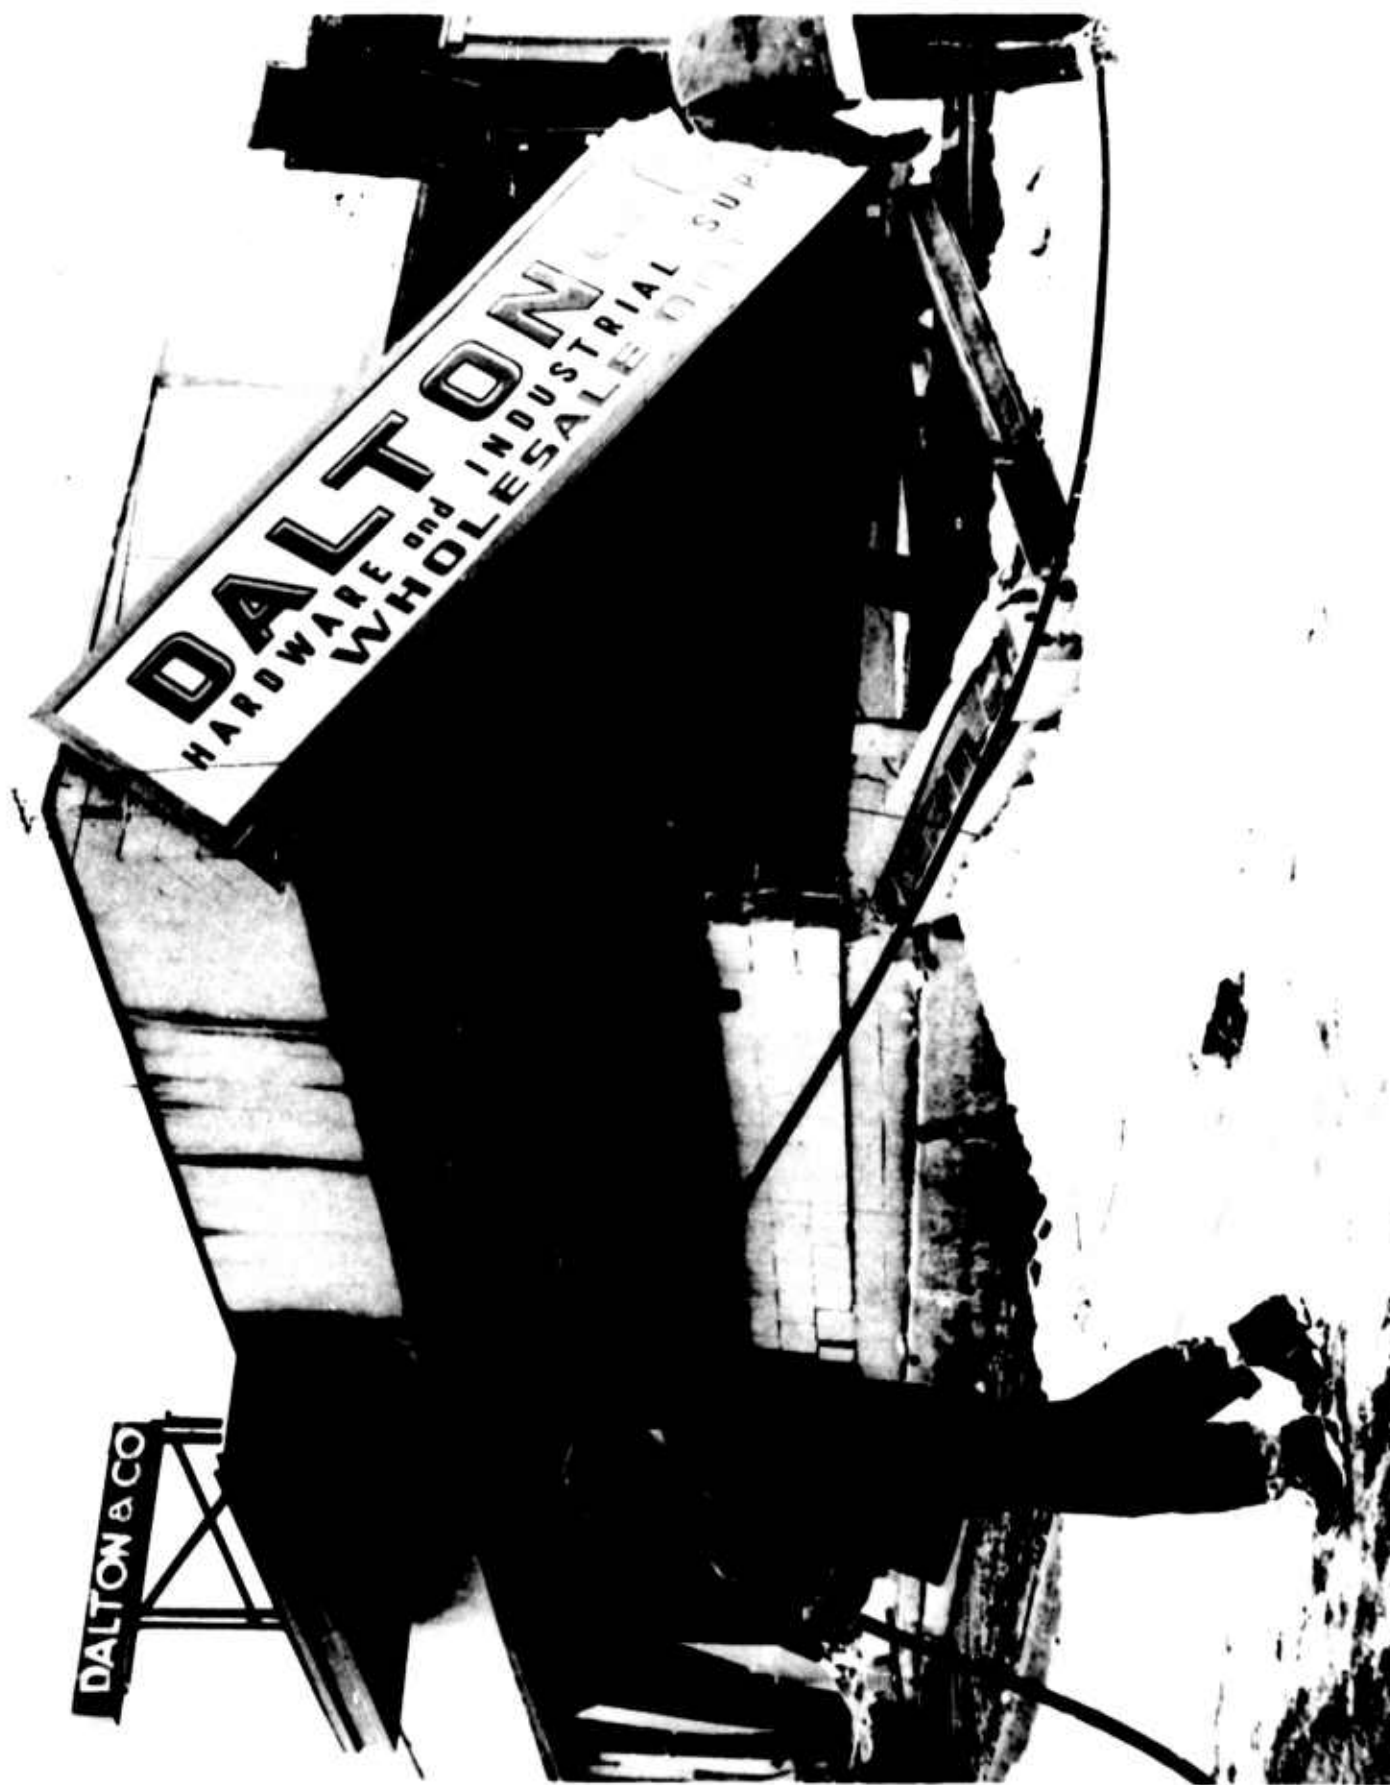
Fourth Avenue Slide (Dalton and Company building, destroyed by pressure ridge north of Second Street)
